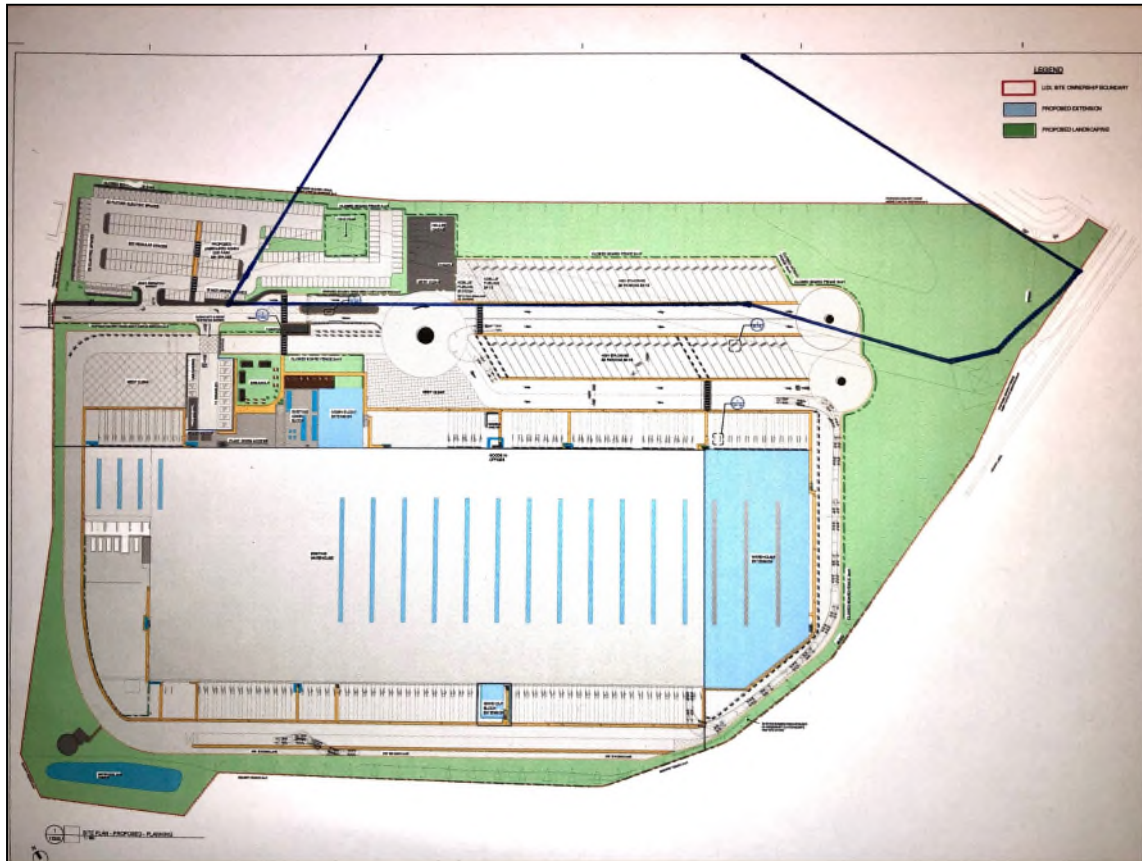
Extract of Site Layout Plan with the Boundary of the SINC in blue
